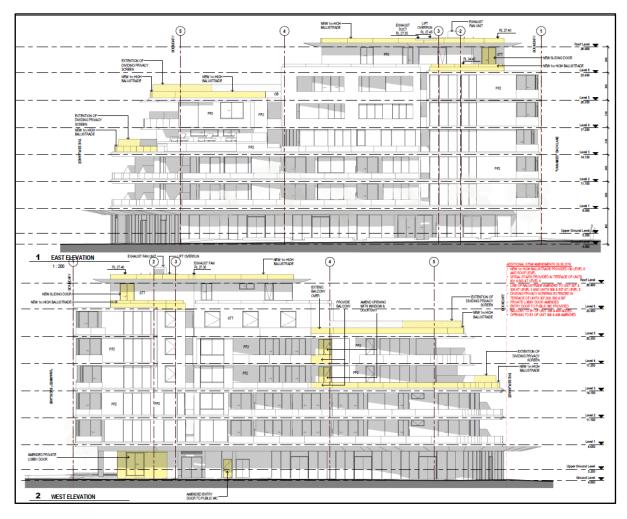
| Original proposed modifications to the East Elevation (top) and West Elevation (bottom) (Source: Applicant's Application)
